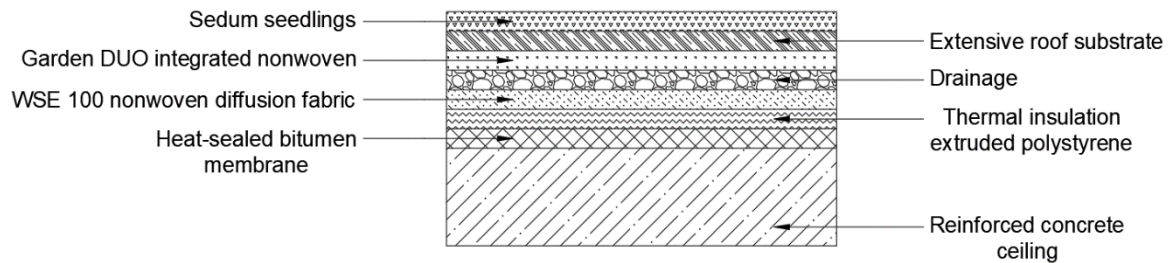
Vegetation on the ceiling above the underground garage (Strzeszewska, 2023).
